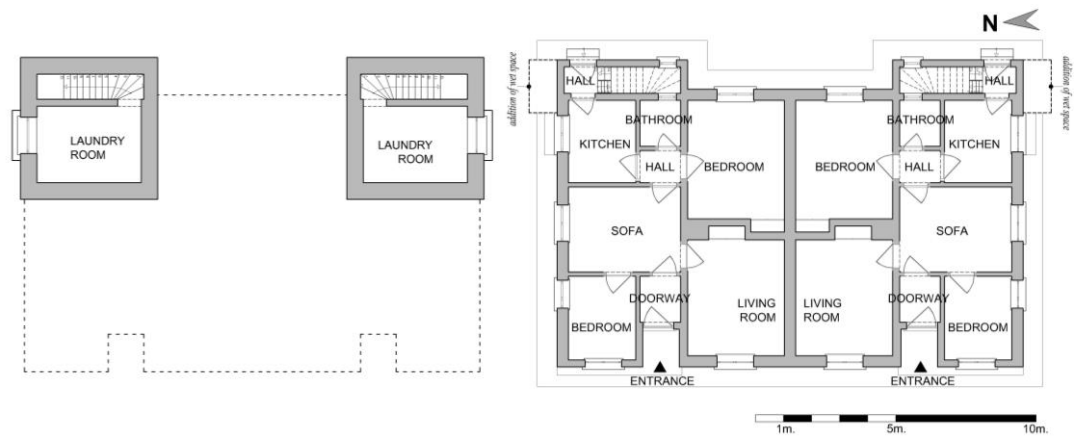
Basement and ground floor plans of Employee Dwelling Type 8
